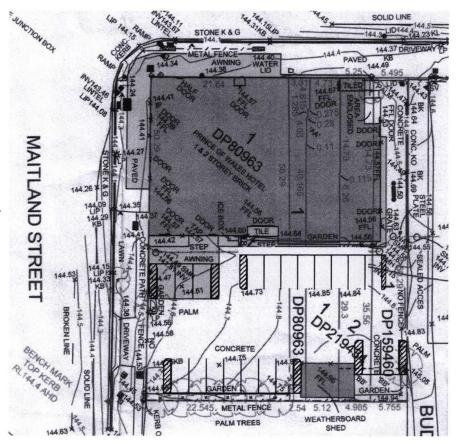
Existing Bottle Shop Site layout and Car Park
